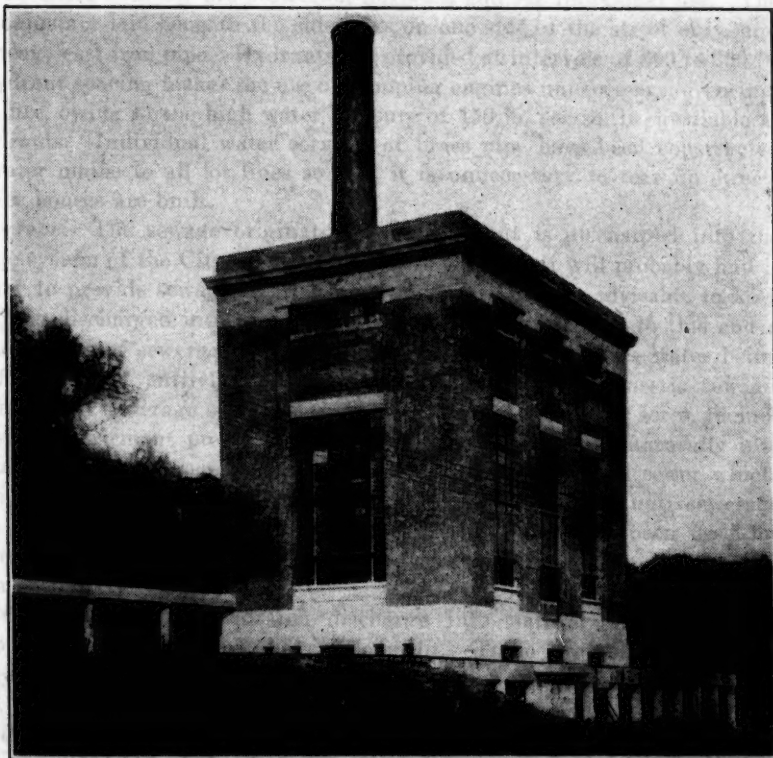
BOILER-HOUSE FOR CENTRAL STATION HEATING SYSTEM, MARIEMONT, OHIO.
